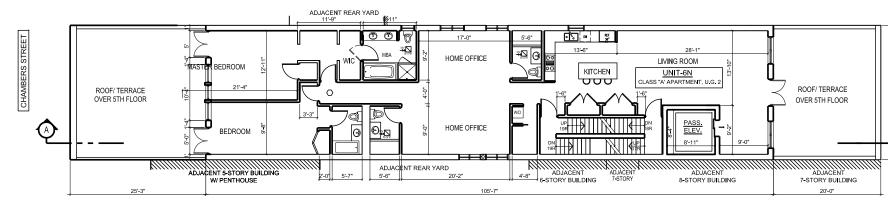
NO-ACTION SIXTH FLOOR PLAN
